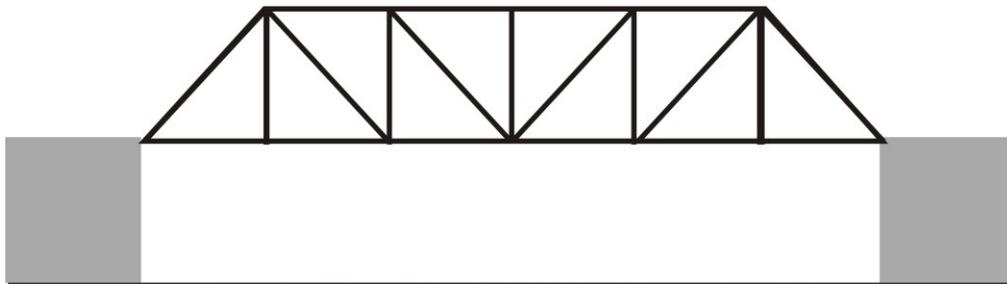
Daphna Creek Pratt Truss Bridge (ca. 1900), Rockingham County, Virginia. This Canton Bridge Company structure is an example of the pony Pratt.
